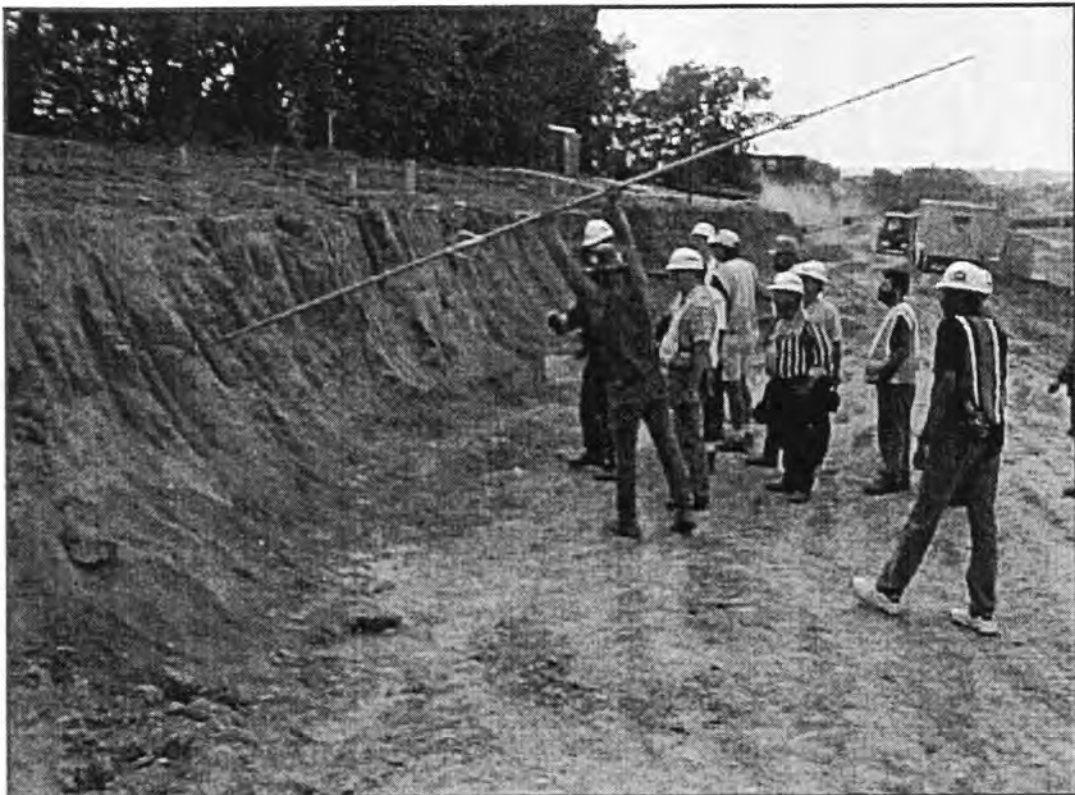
Picture showing steel tendon being placed in the drilled and grouted hole
